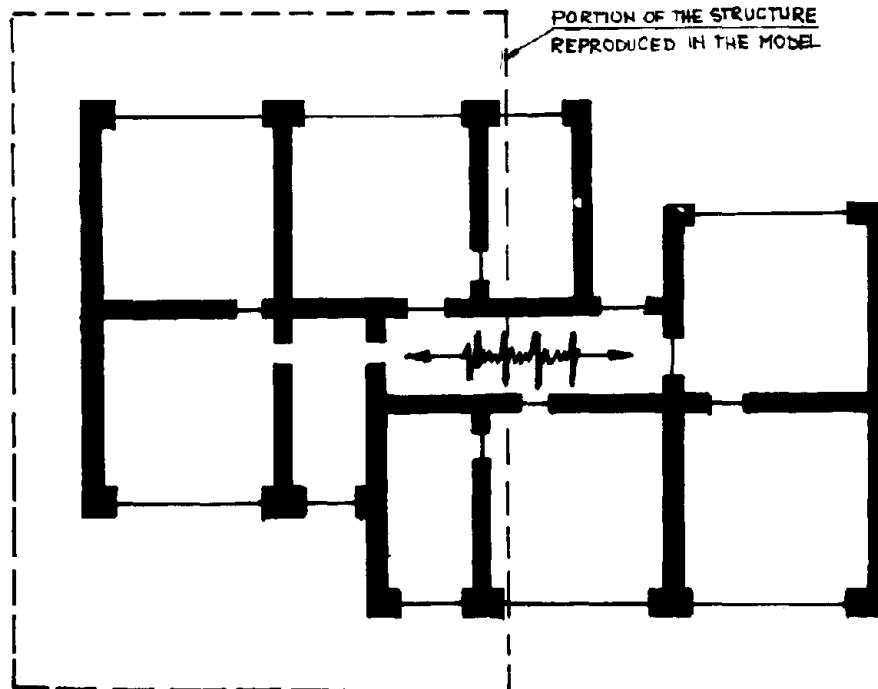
FLOOR PLAN OF A FIVE STORY CELLULAR STRUCTURE.
